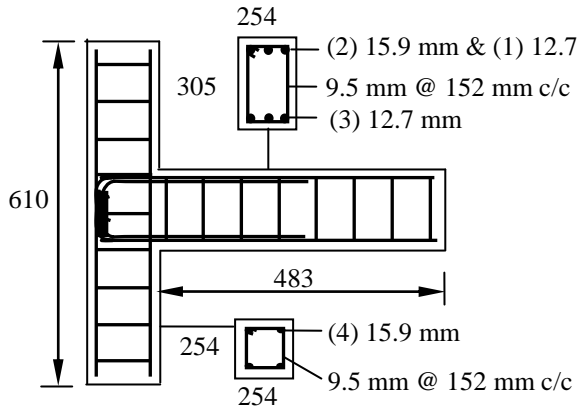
Geometry and reinforcement details for the external (T-shape) beam-column joint tested by Bayasi and Gebman [18] – all dimensions are in mm
